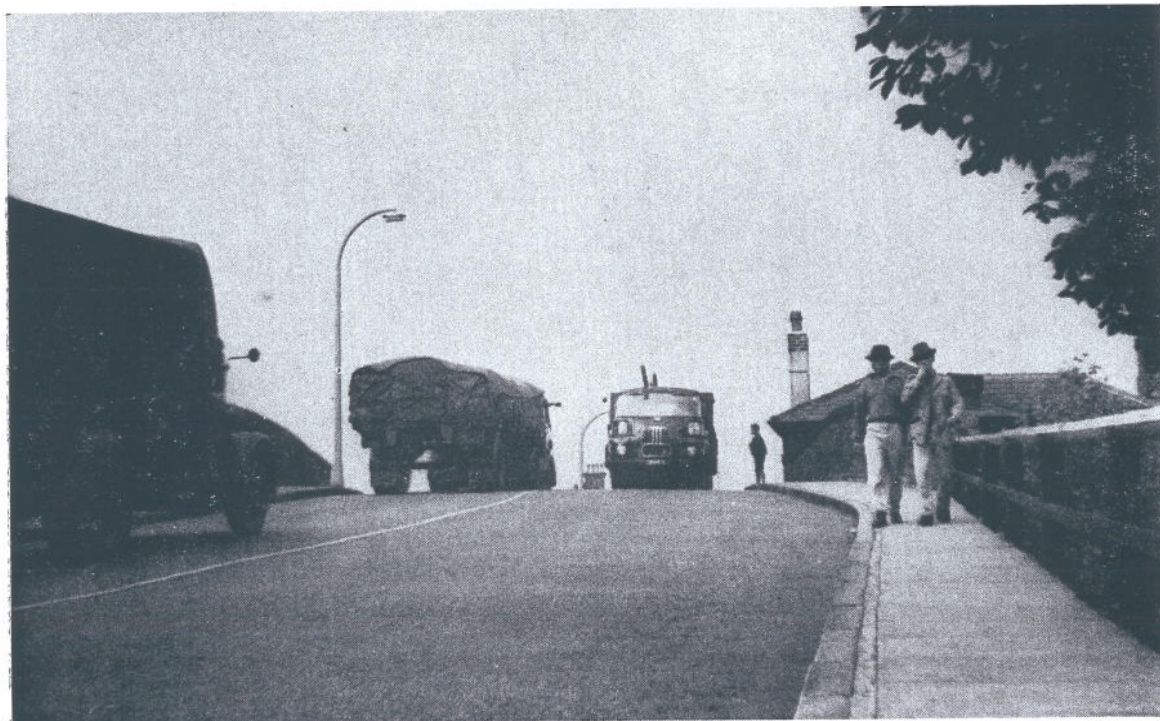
Liverpool–Preston Trunk Road A59.—Hump backed bridge in Burscough, Ormskirk.
